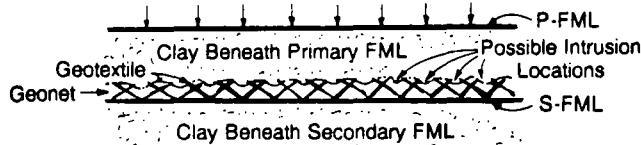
Geotextile used as barrier material to prevent extrusion of upper clay into geonet drain.
